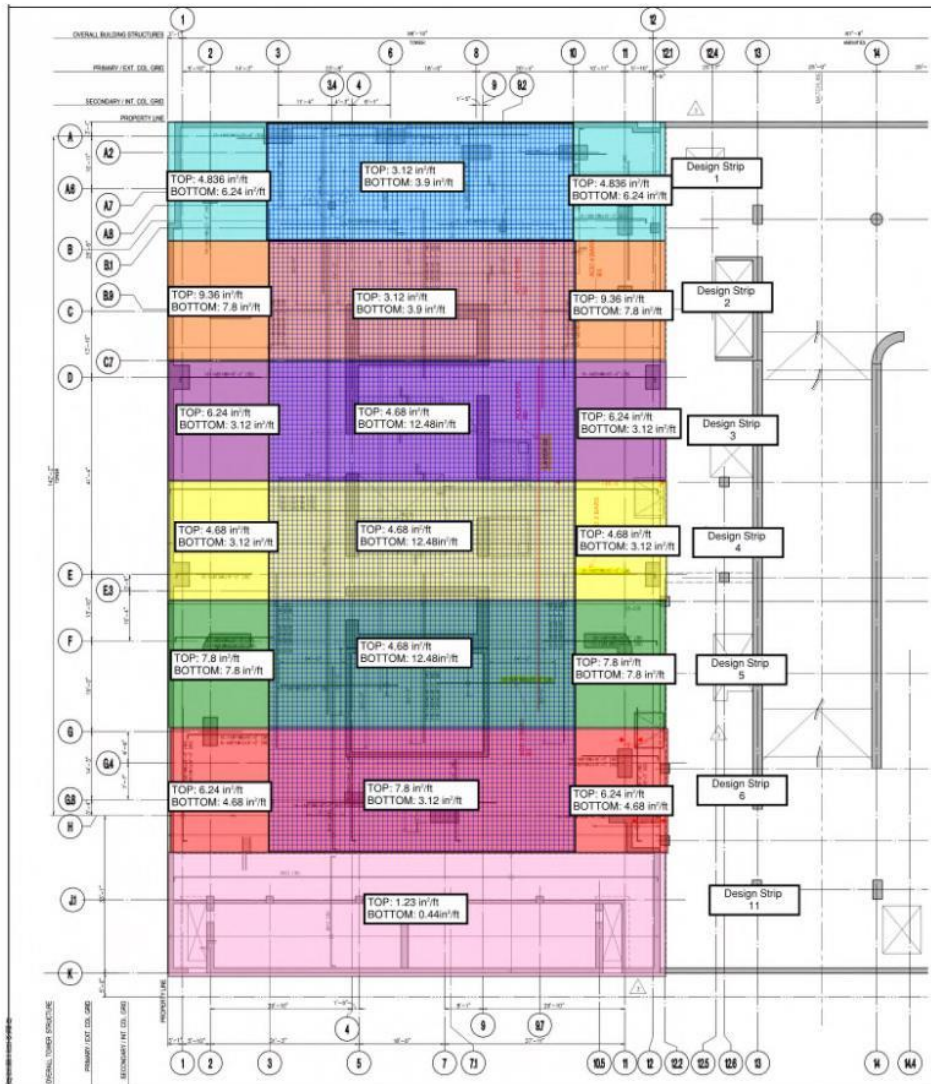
Design strip reinforcing in as-built pile cap (for design strips 1-6)
